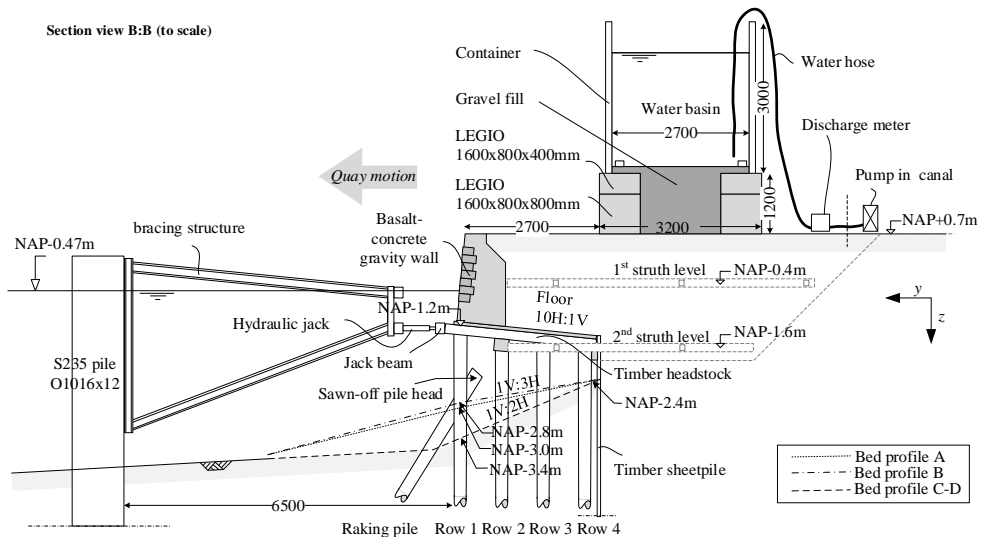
, Section view B:B of quay wall experiment for segment A.I.
